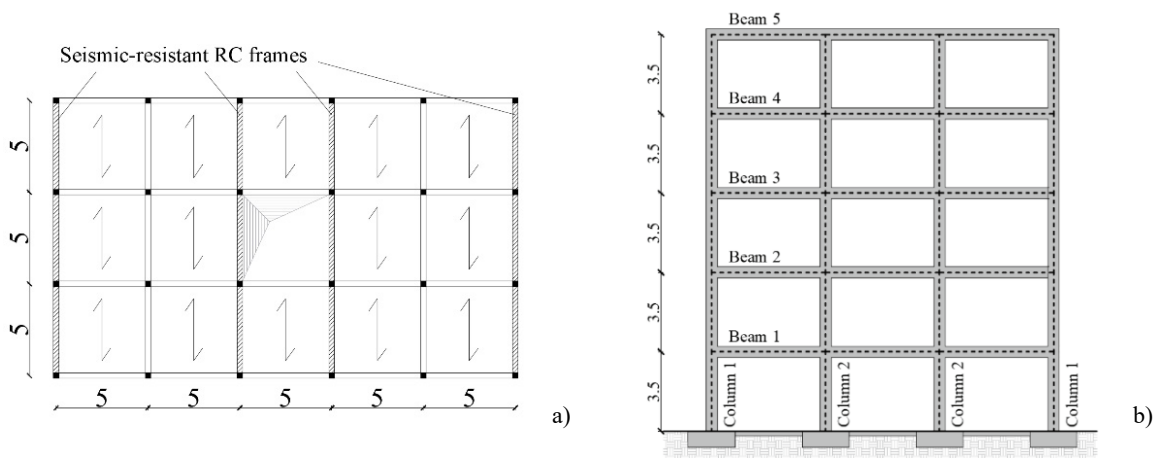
Reference case study building: a) plan view; b) selected frame.
